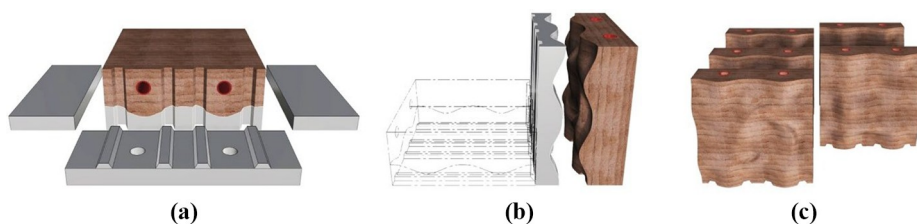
Formwork system and resulting blocks: (a) initial block setting after 24-h with side panels removed showing the CNC-milled base with sling notches, (b) flipped block setting after 48-h initial curing period with the base removed and (c) finished rammed earth blocks arranged for the remaining three-week moisture stabilization
